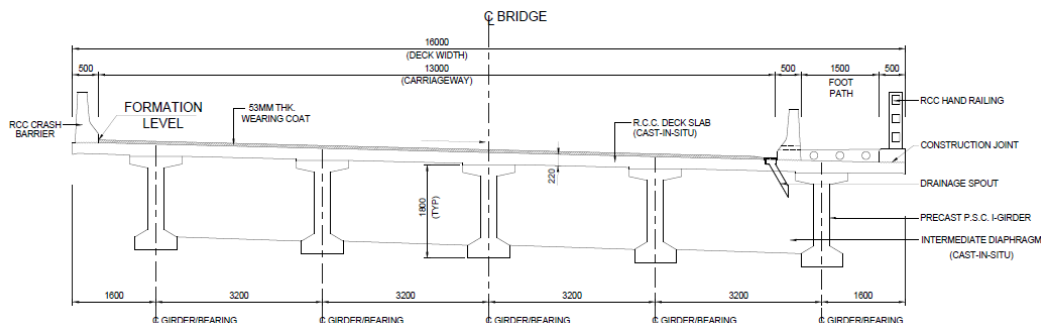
7 Cross section of 30m span OC post tensioned I girder at mid span
